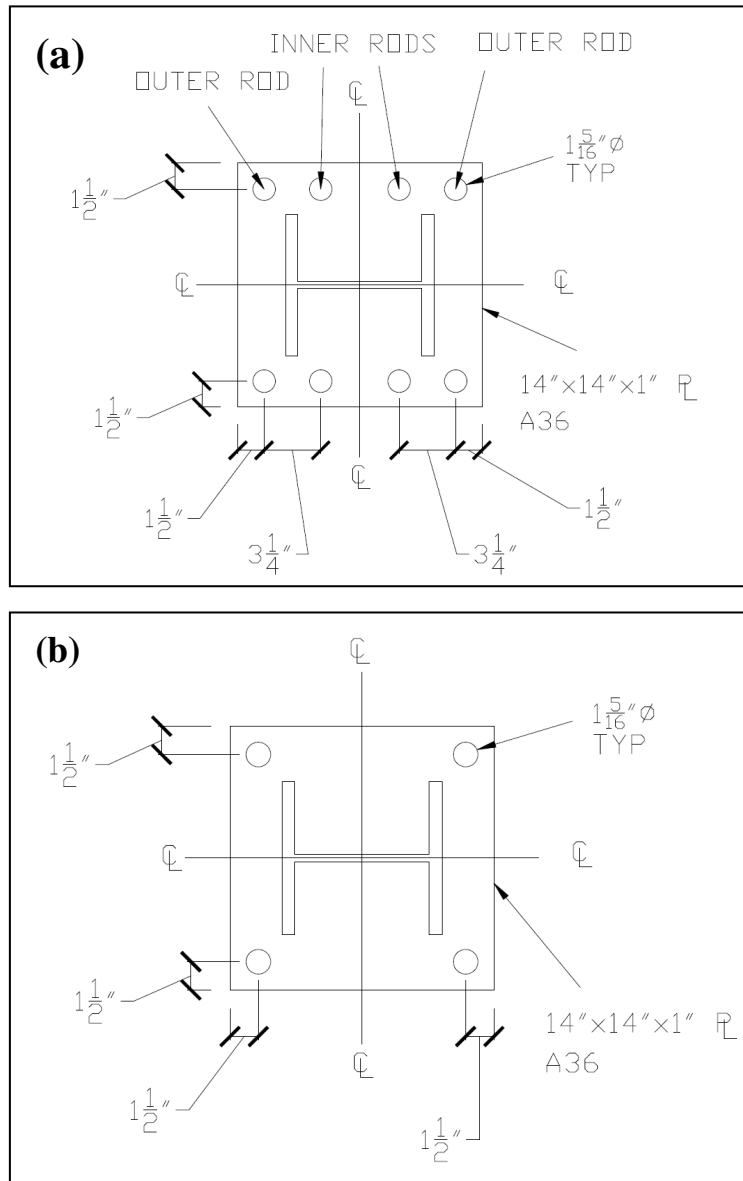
Base plate footprints for (a) Test # 3 and (b) all other tests
